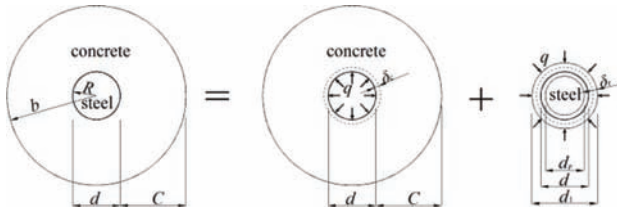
Deformations of rust layer and surrounding concrete under expansive pressure in the non-cracking stage.
